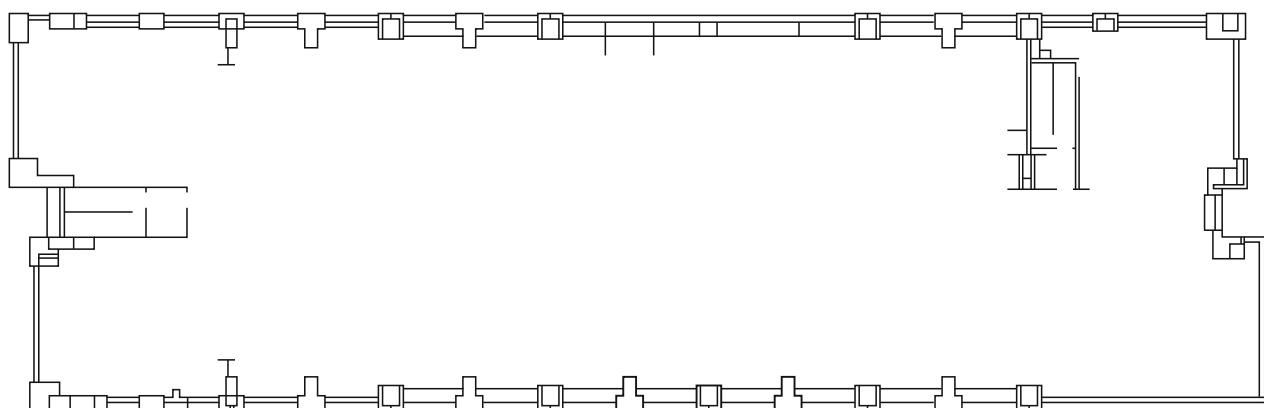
Floor plan of floors 11–20 (the office space)
